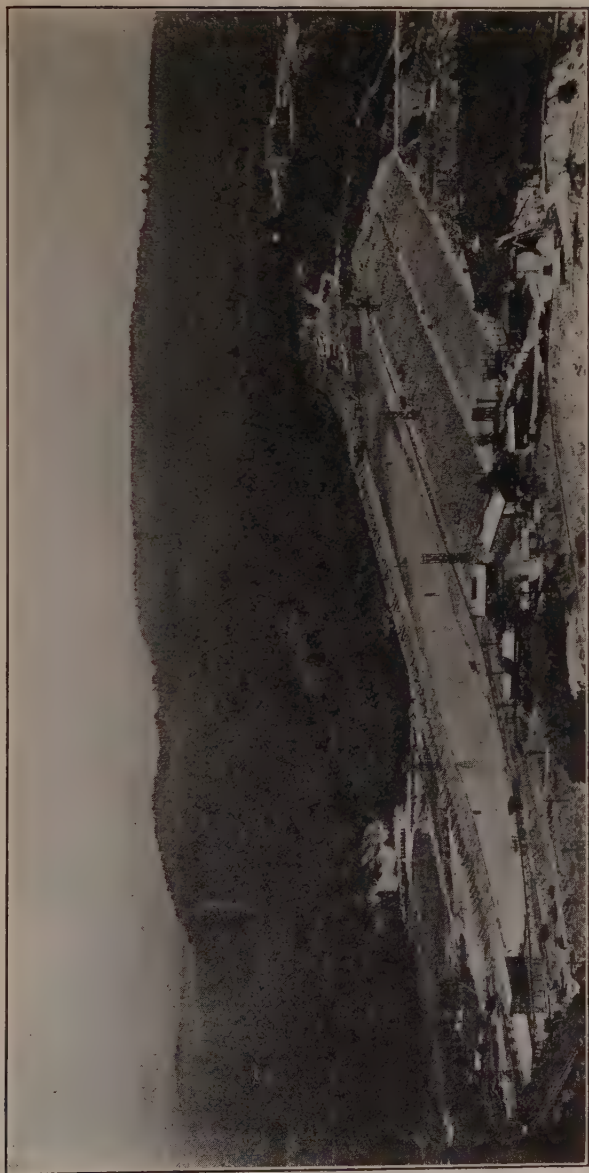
GENERAL VIEW OF CONSTRUCTION OF QUABBIN DAM, LOOKING SOUTHWESTERLY — ADMINISTRATION BUILDINGS SHOWN AT THE EXTREME RIGHT
